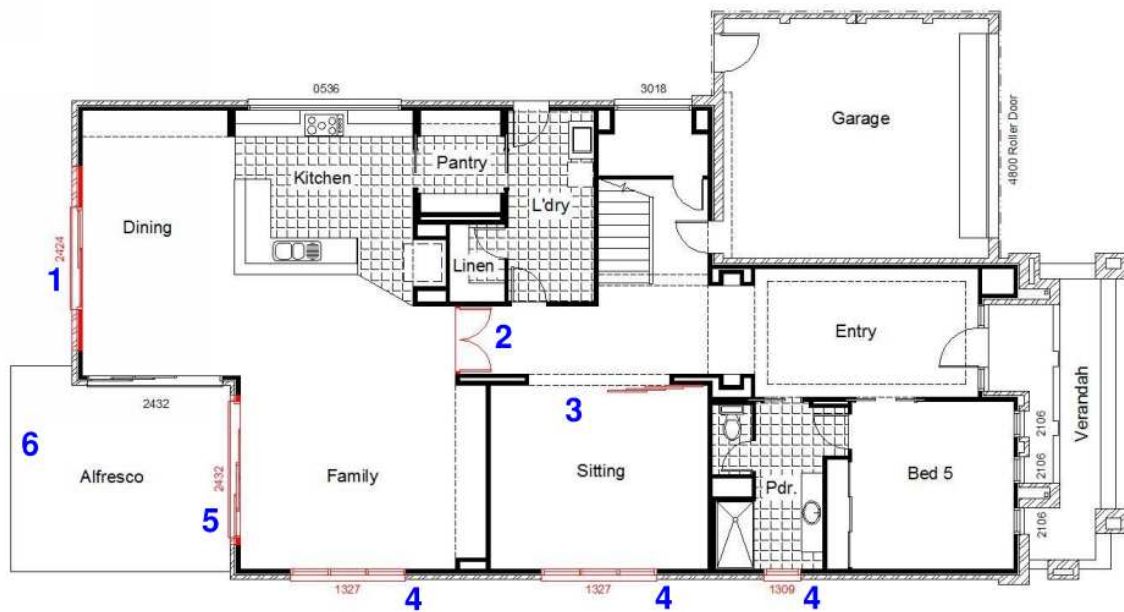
Redesigned ground floor plan for Dwelling 12 in Darwin.
